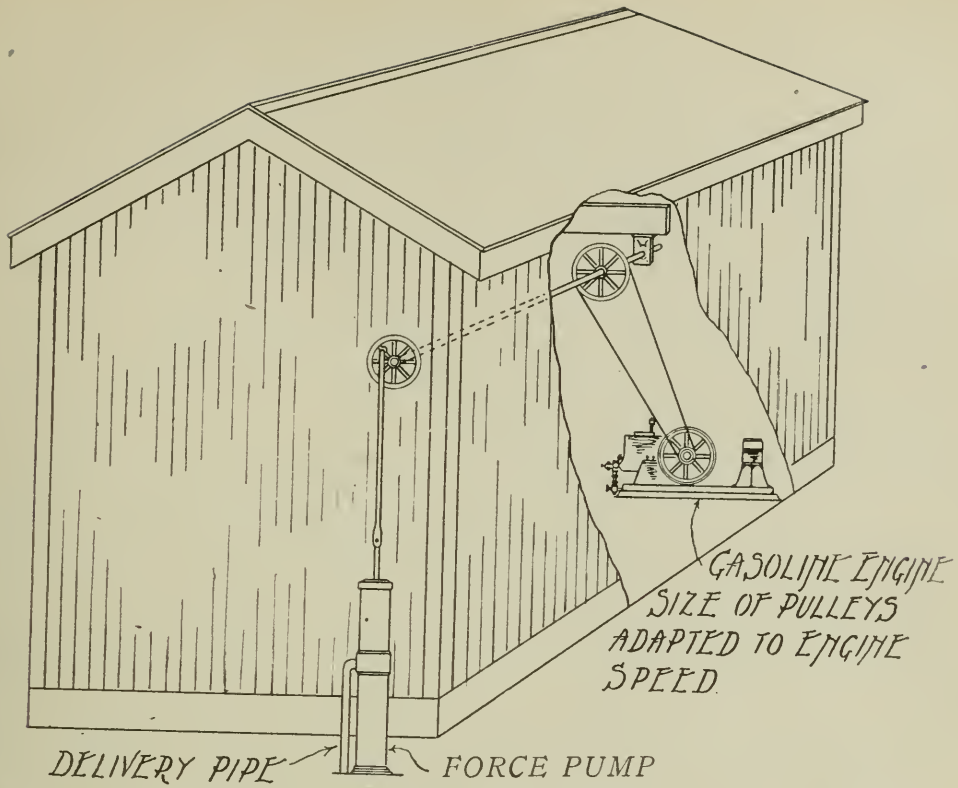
Pump operated by pulley on line shaft driven by gasoline engine.
